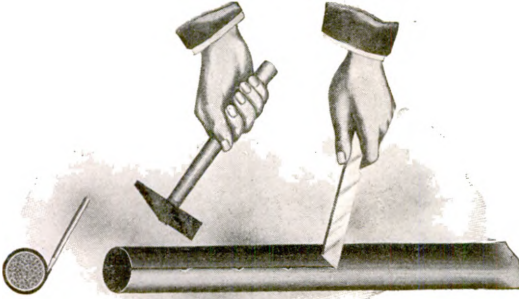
CABLE, PAPER INSULATION, SPLICING.
